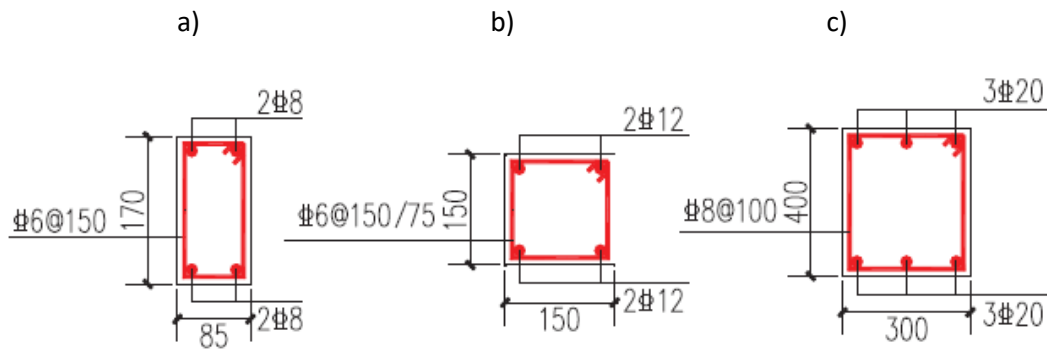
Section details of the elements following design; a) beam, b) column, c) beam base [Ref.: 040]
